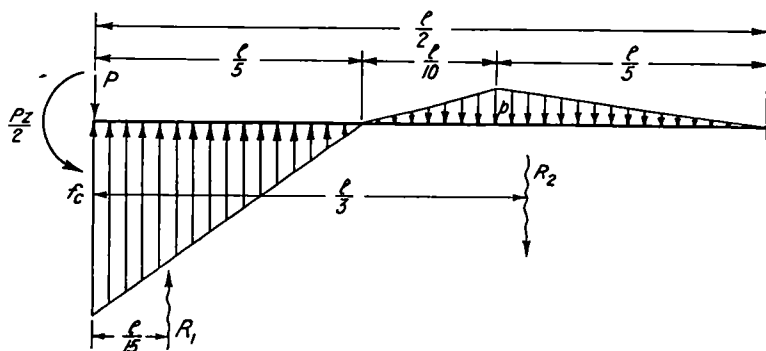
External Forces Acting on Embedded End of Dowel Bar
